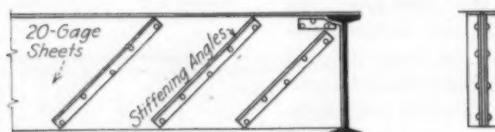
The Chicago joist, patented by T. O'Shea and manufactured in Chicago from 1887 to 1893, used stiffening angles to prevent buckling of the web and to help take diagonal stresses.
